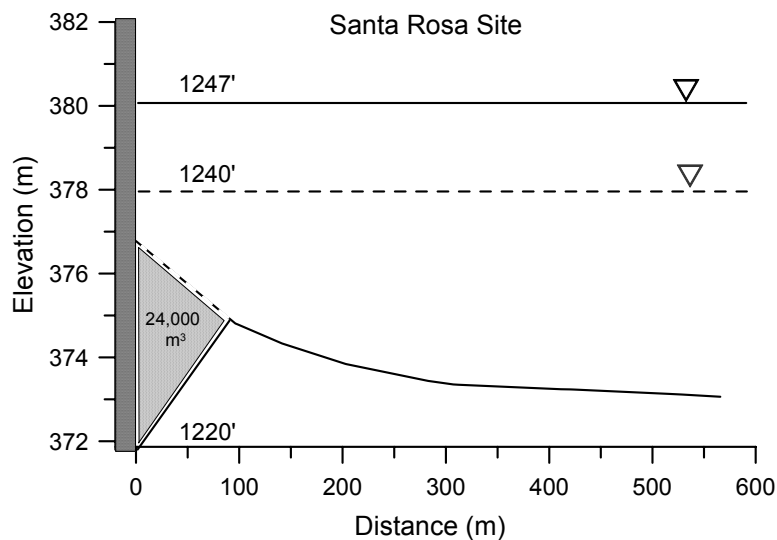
Approximate longitudinal cross-section near intake showing bottom contour and zone of sediment excavation: Santa Rosa site.
